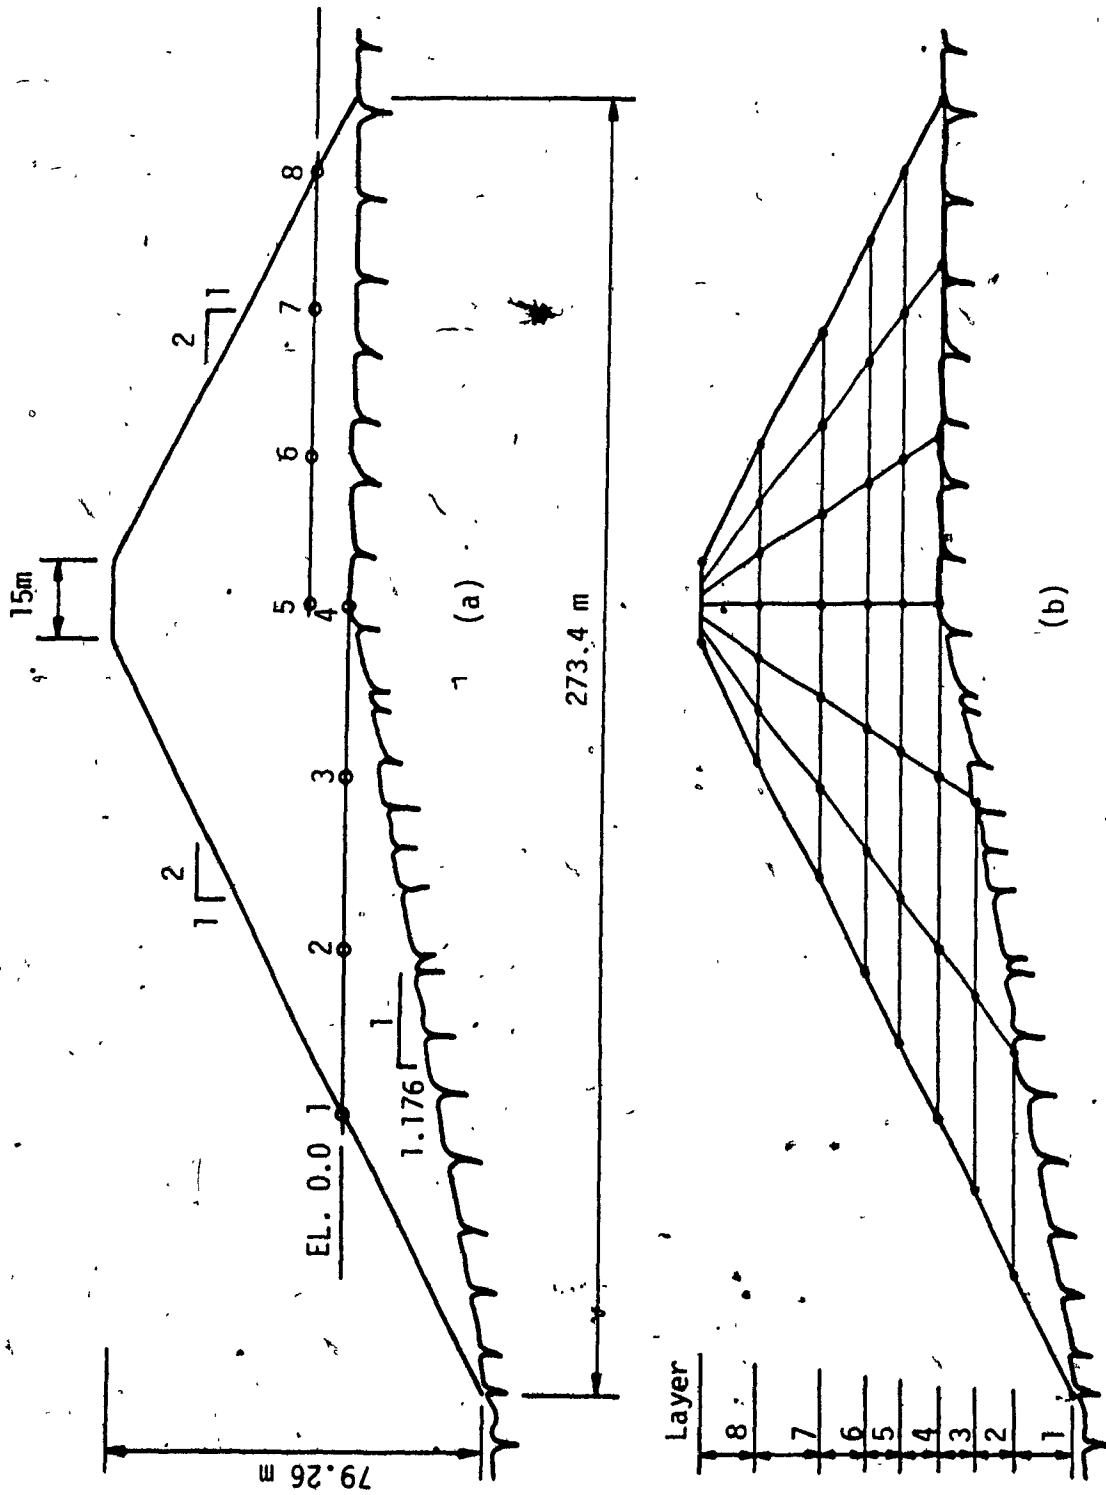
Embankment structure: (a) dam cross-section with points where comparisons are made; (b) finite element mesh with layers of soil fill during construction
